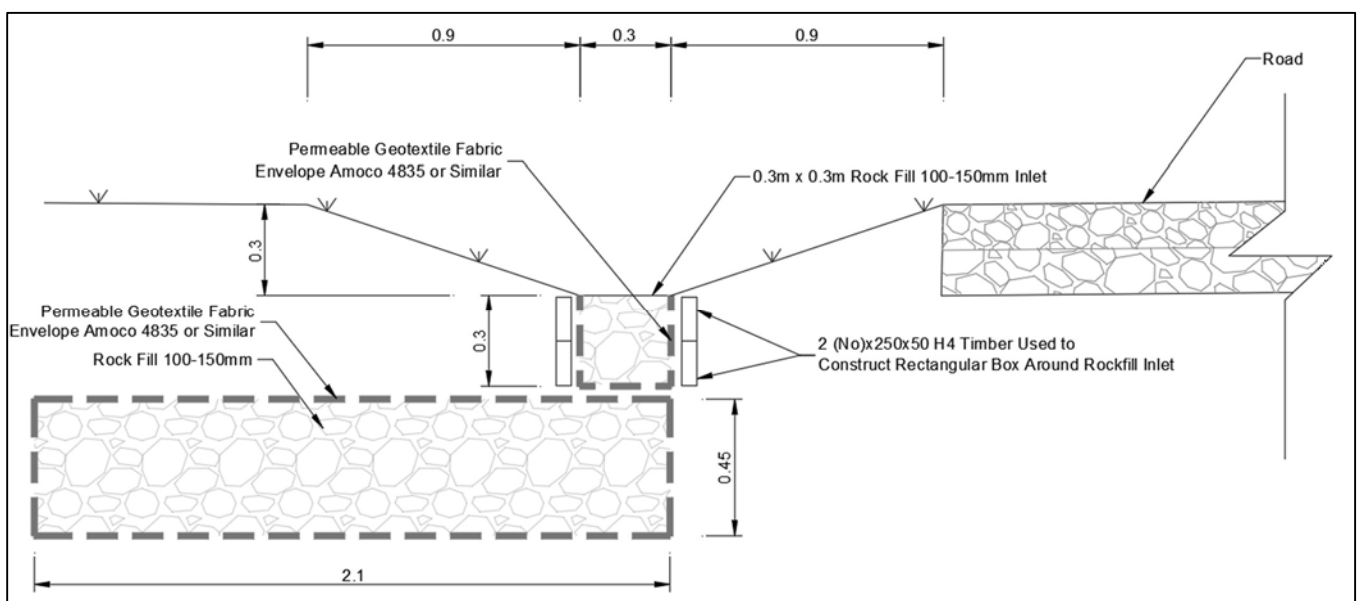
Soak Pit for Roads – Rock filled (Cross-section View)
